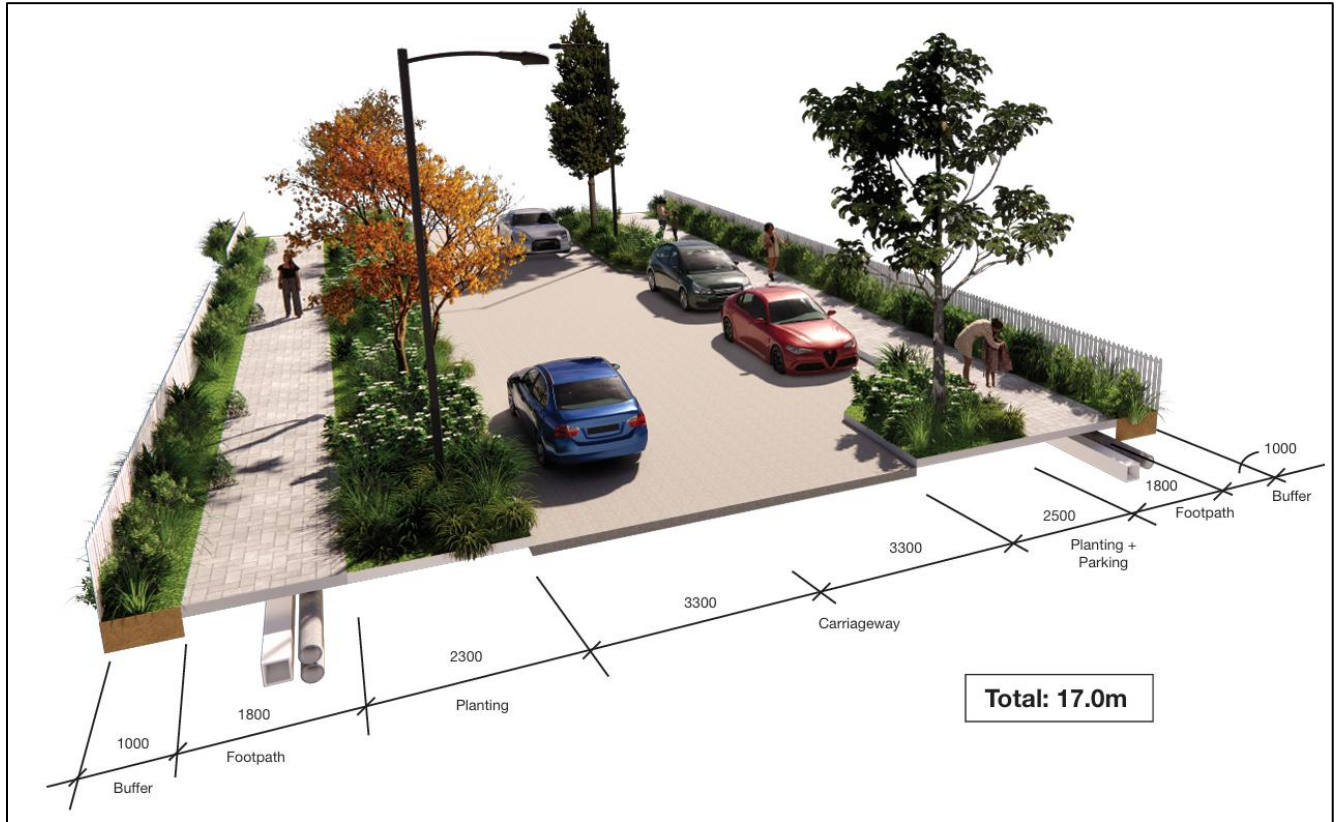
Wide Local Road (Industrial) Cross-Section
